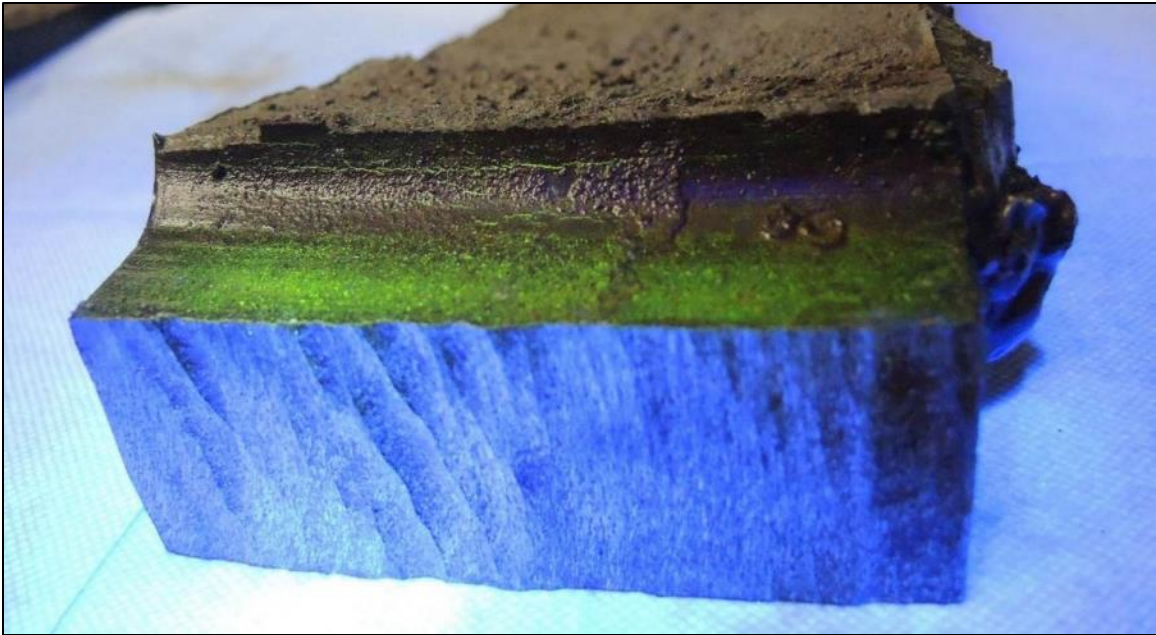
Secondary cracking in the radius of the weld access hole of sample D.4-SW as identified by fluorescent magnetic particle testing.
